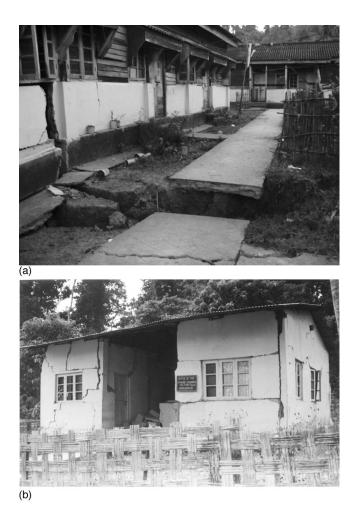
Damage to residential buildings: (a) severe damage to houses in the government residential area in Nimbudera village in Middle Andaman Island, where large ground motion and liquefaction were noted; and (b) at Mohanpur village in North Andaman Island, a single-story masonry building—despite having a light roof—sustained severe damage due to the lack of any earthquake-resistant features; the area around the building seems to have suffered significant amplification of the ground motion (photos: G. Mondal).
